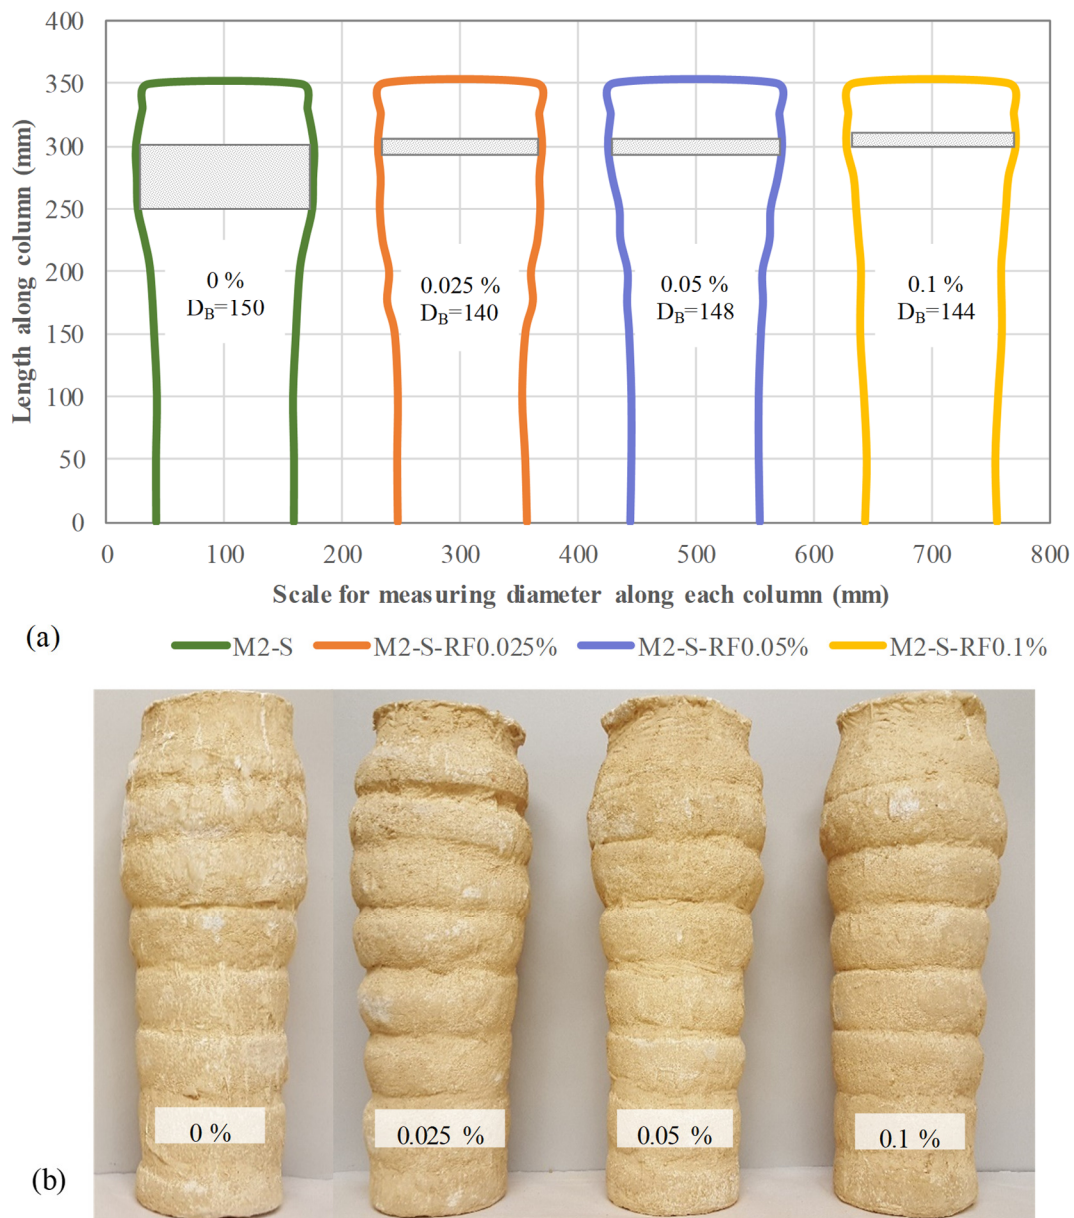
Deformations of tested columns reinforced with randomly mixed PET fibres, and installed in a base silt at LL, (a) graphical plot and (b) pictorial illustration
